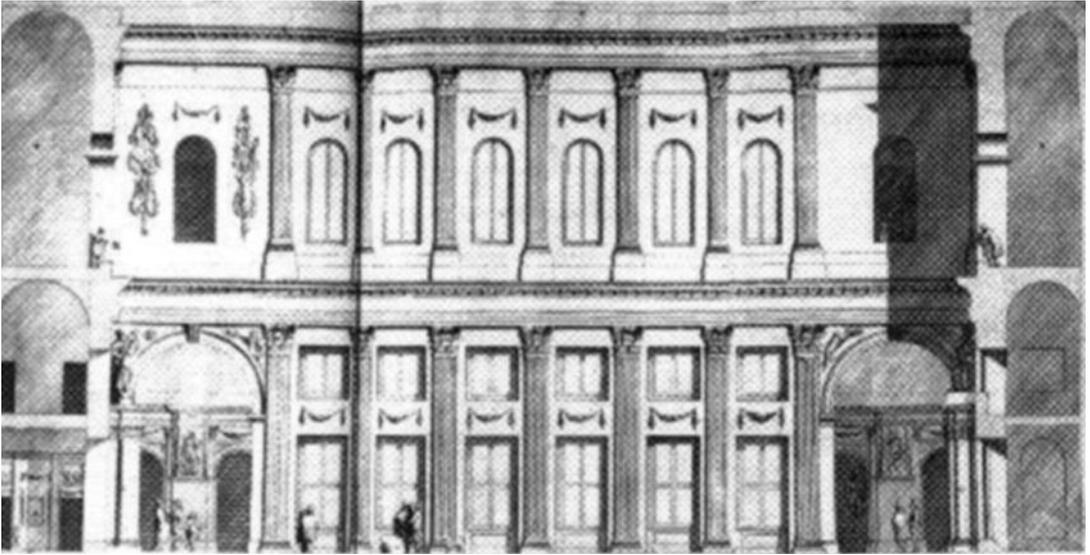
Jacob van Campen, Burgerzaal, Amsterdam Town Hall, 1648-65. Engraving by J. Vennekool, 1661.
